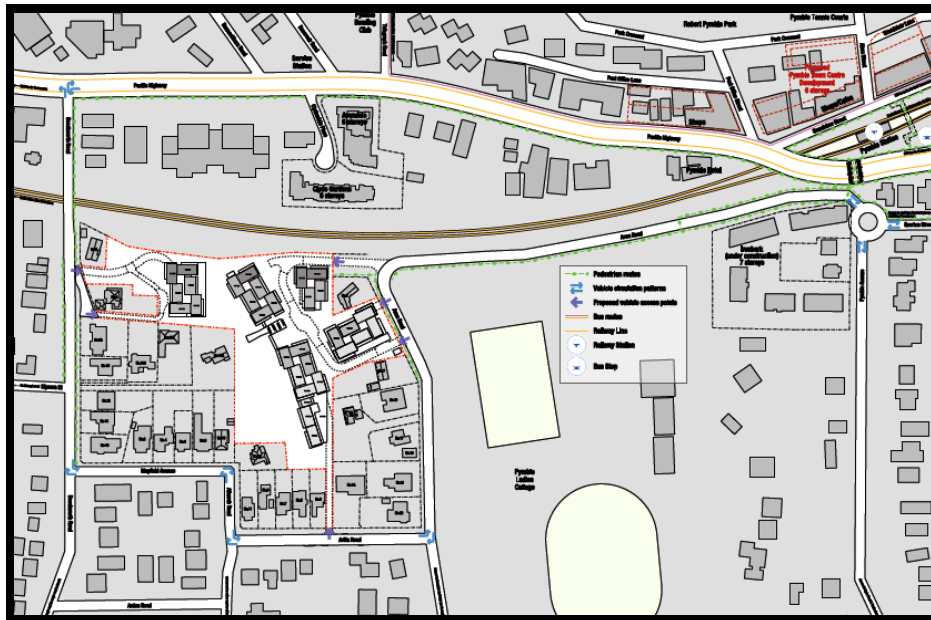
Locality/Context Plan. (Source: Anchor Mortlock Woolley, 2009)
